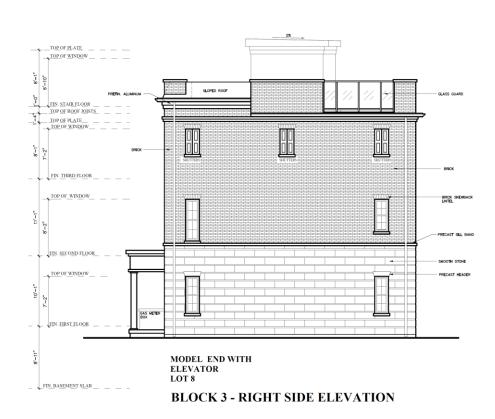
Block 3 Right Side Elevation (model end with elevator), Sheet A5 (FBP Architects Inc., September 1, 2023)
